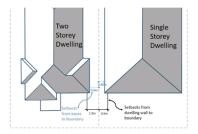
HOW TO MEASURE SIDE BUILDING SETBACKS
